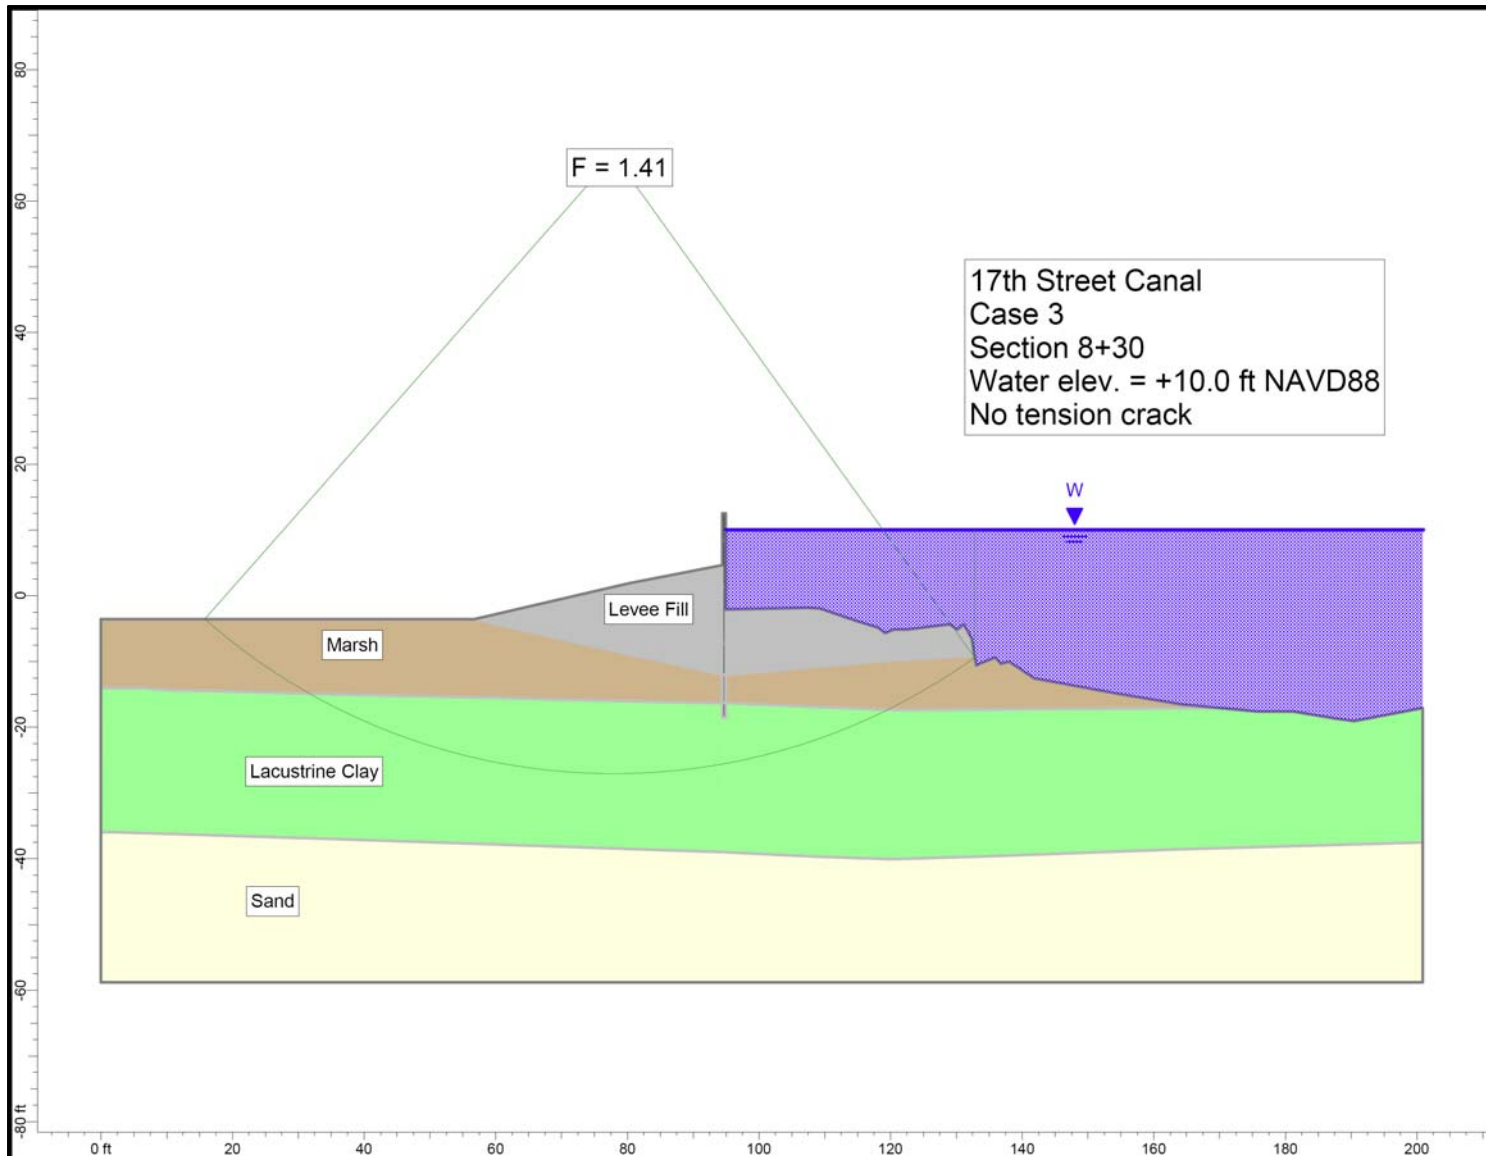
Critical Circle for 17th Street Canal Station 8+30 – Water Elevation 10 ft, No Tension Crack
